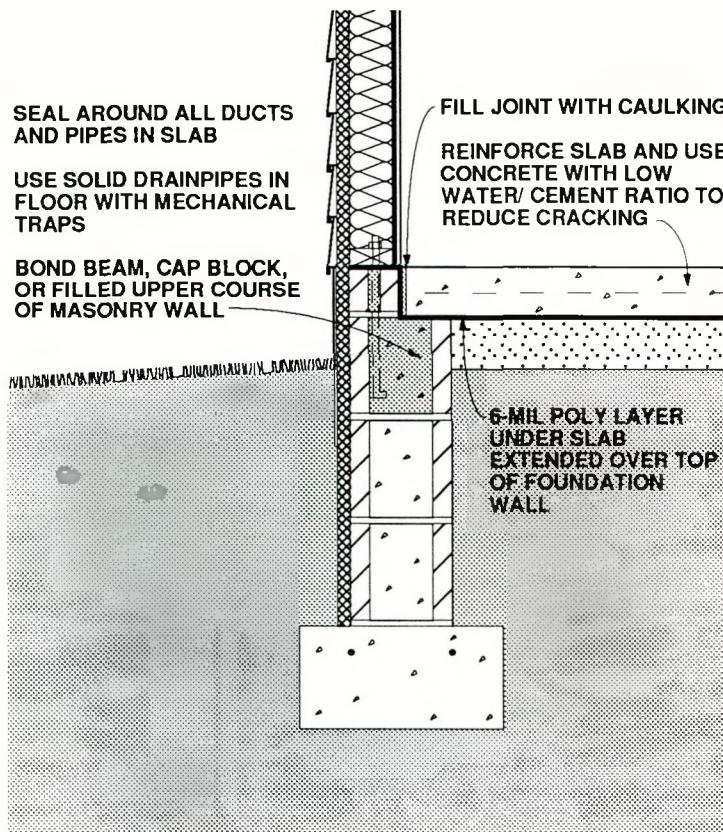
Radon Control Techniques for Slab-on-Grade Foundations
